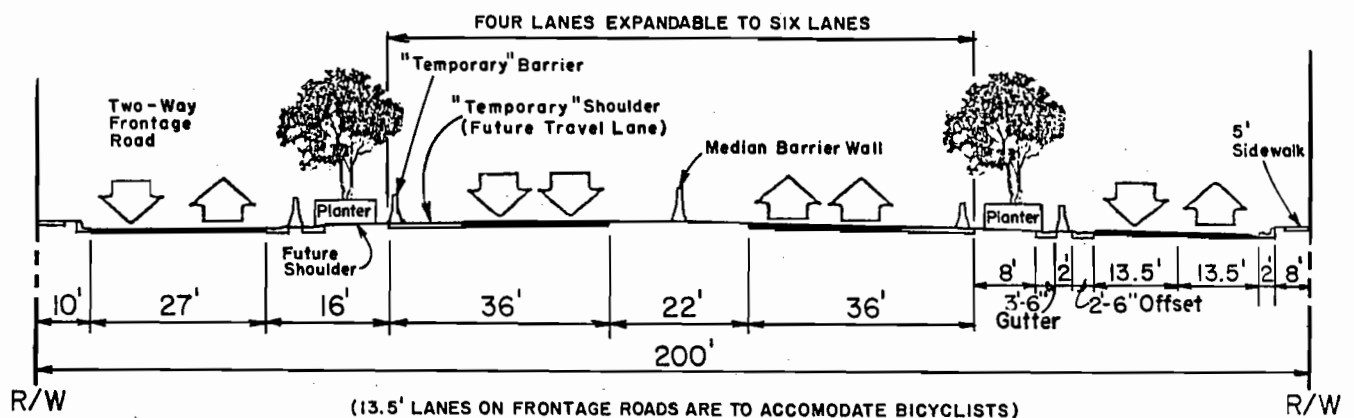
TYPICAL SECTIONS CONSIDERED: VAN DYKE to US 41
